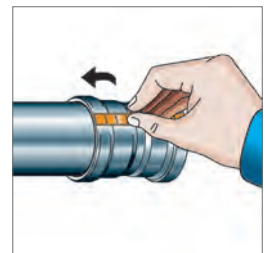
Remove the checking strip – the connection is marked as having been pressed.
